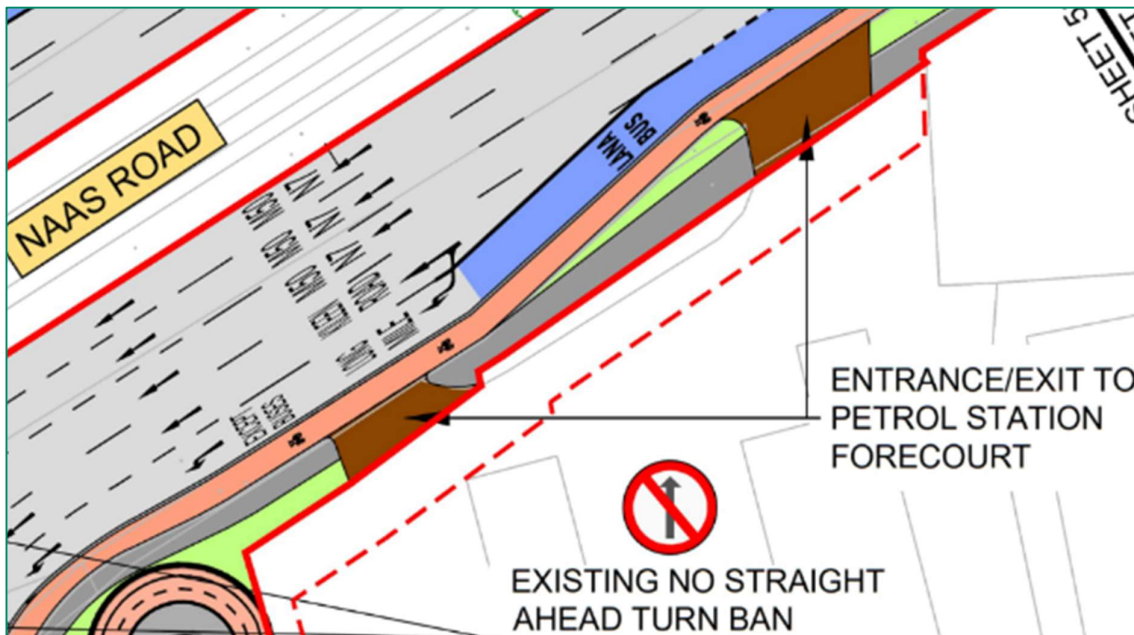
Extract from Proposed Scheme General Arrangement drawings showing proposed cycle track at Naas Road frontage (Image source: Google)
